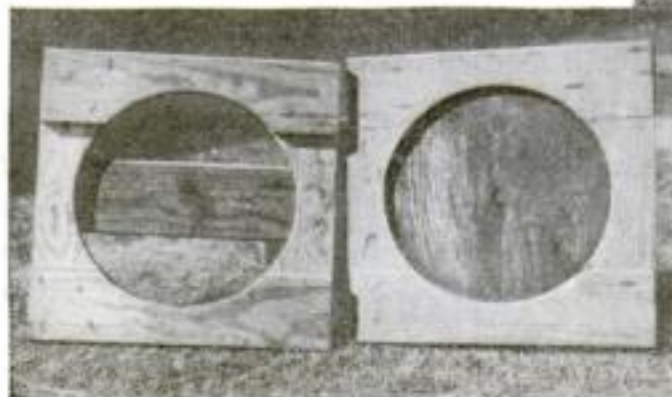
The form consists of a cylinder of sheet tin held to shape by a wooden top and bottom, which are braced as shown. A brace across top holds shaft central.
